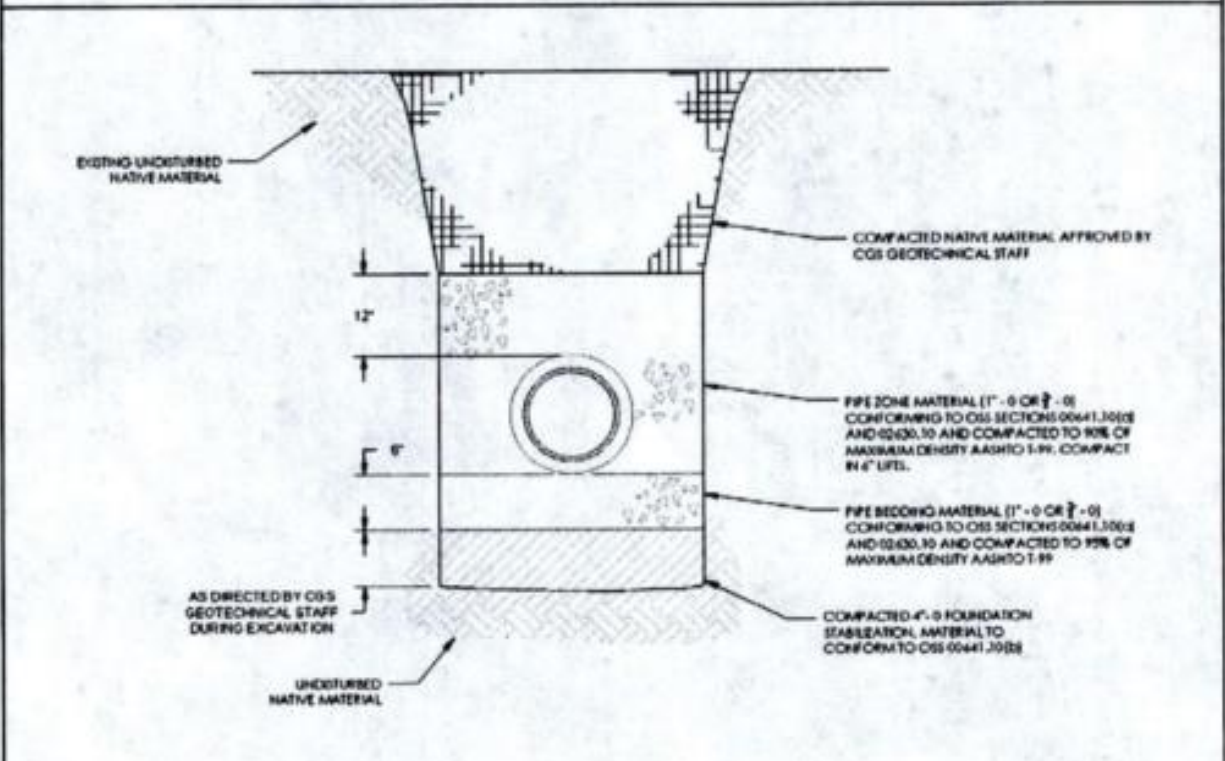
Figure C – Trench Not in ROW, Under Structure or Pavement, Etc.
